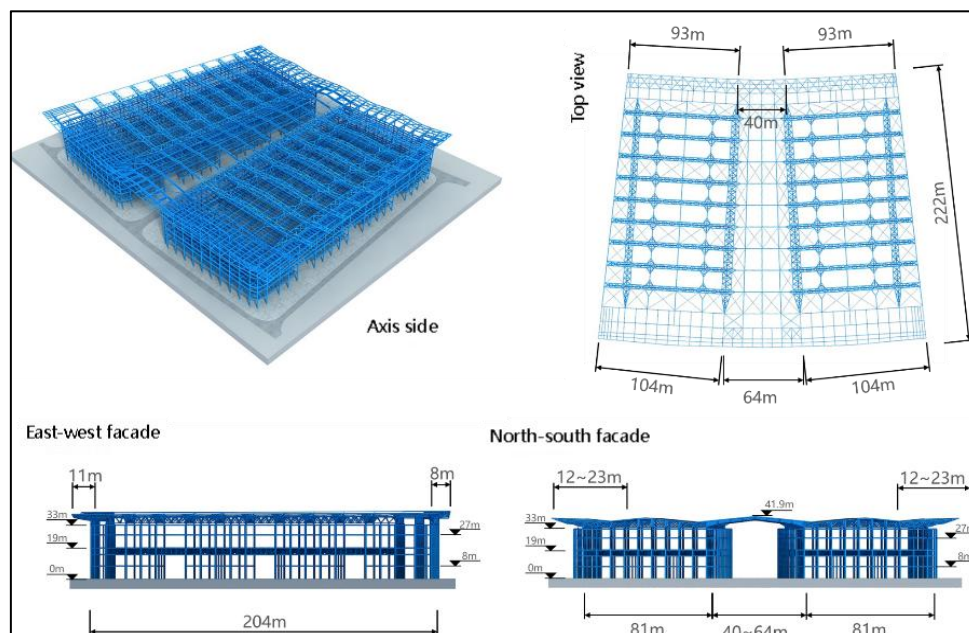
Overview of Double-Layer Steel Structure Exhibition Halls
